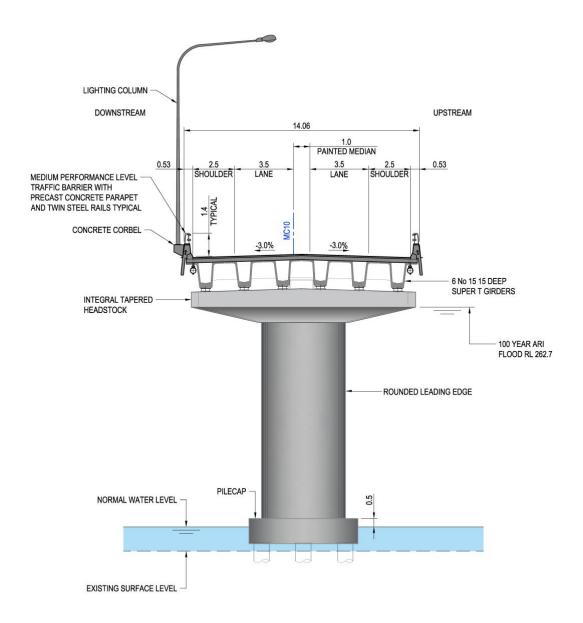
Typical cross section of the proposed modification at New Dubbo Bridge
